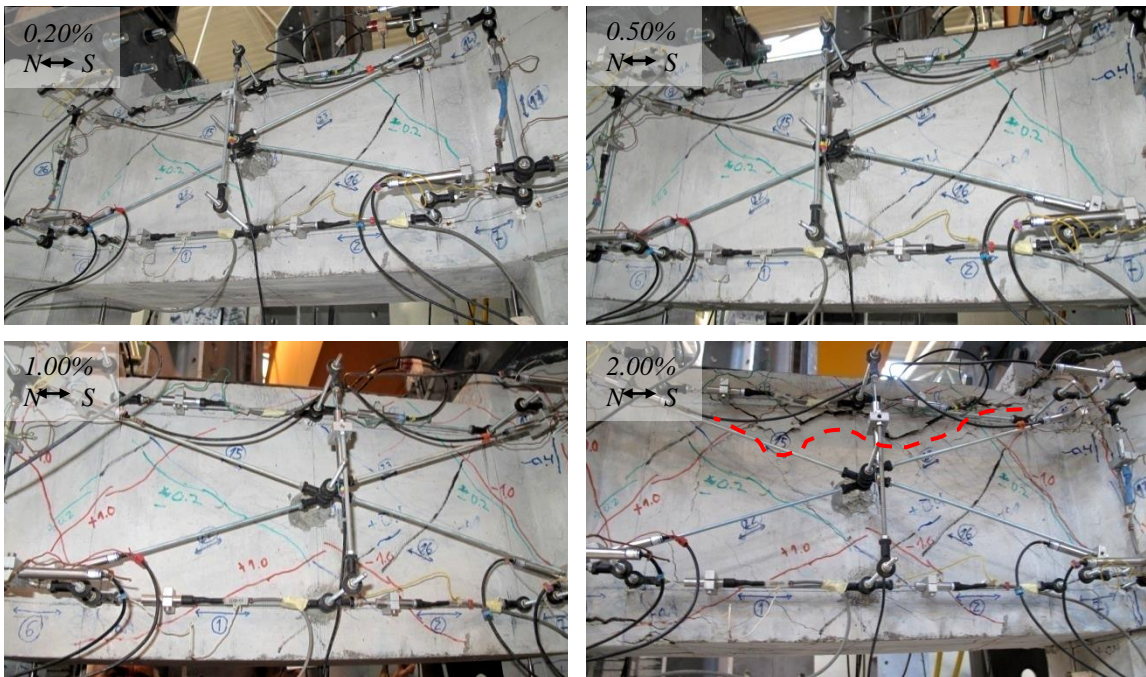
SP_M04 Beam cracking pattern
